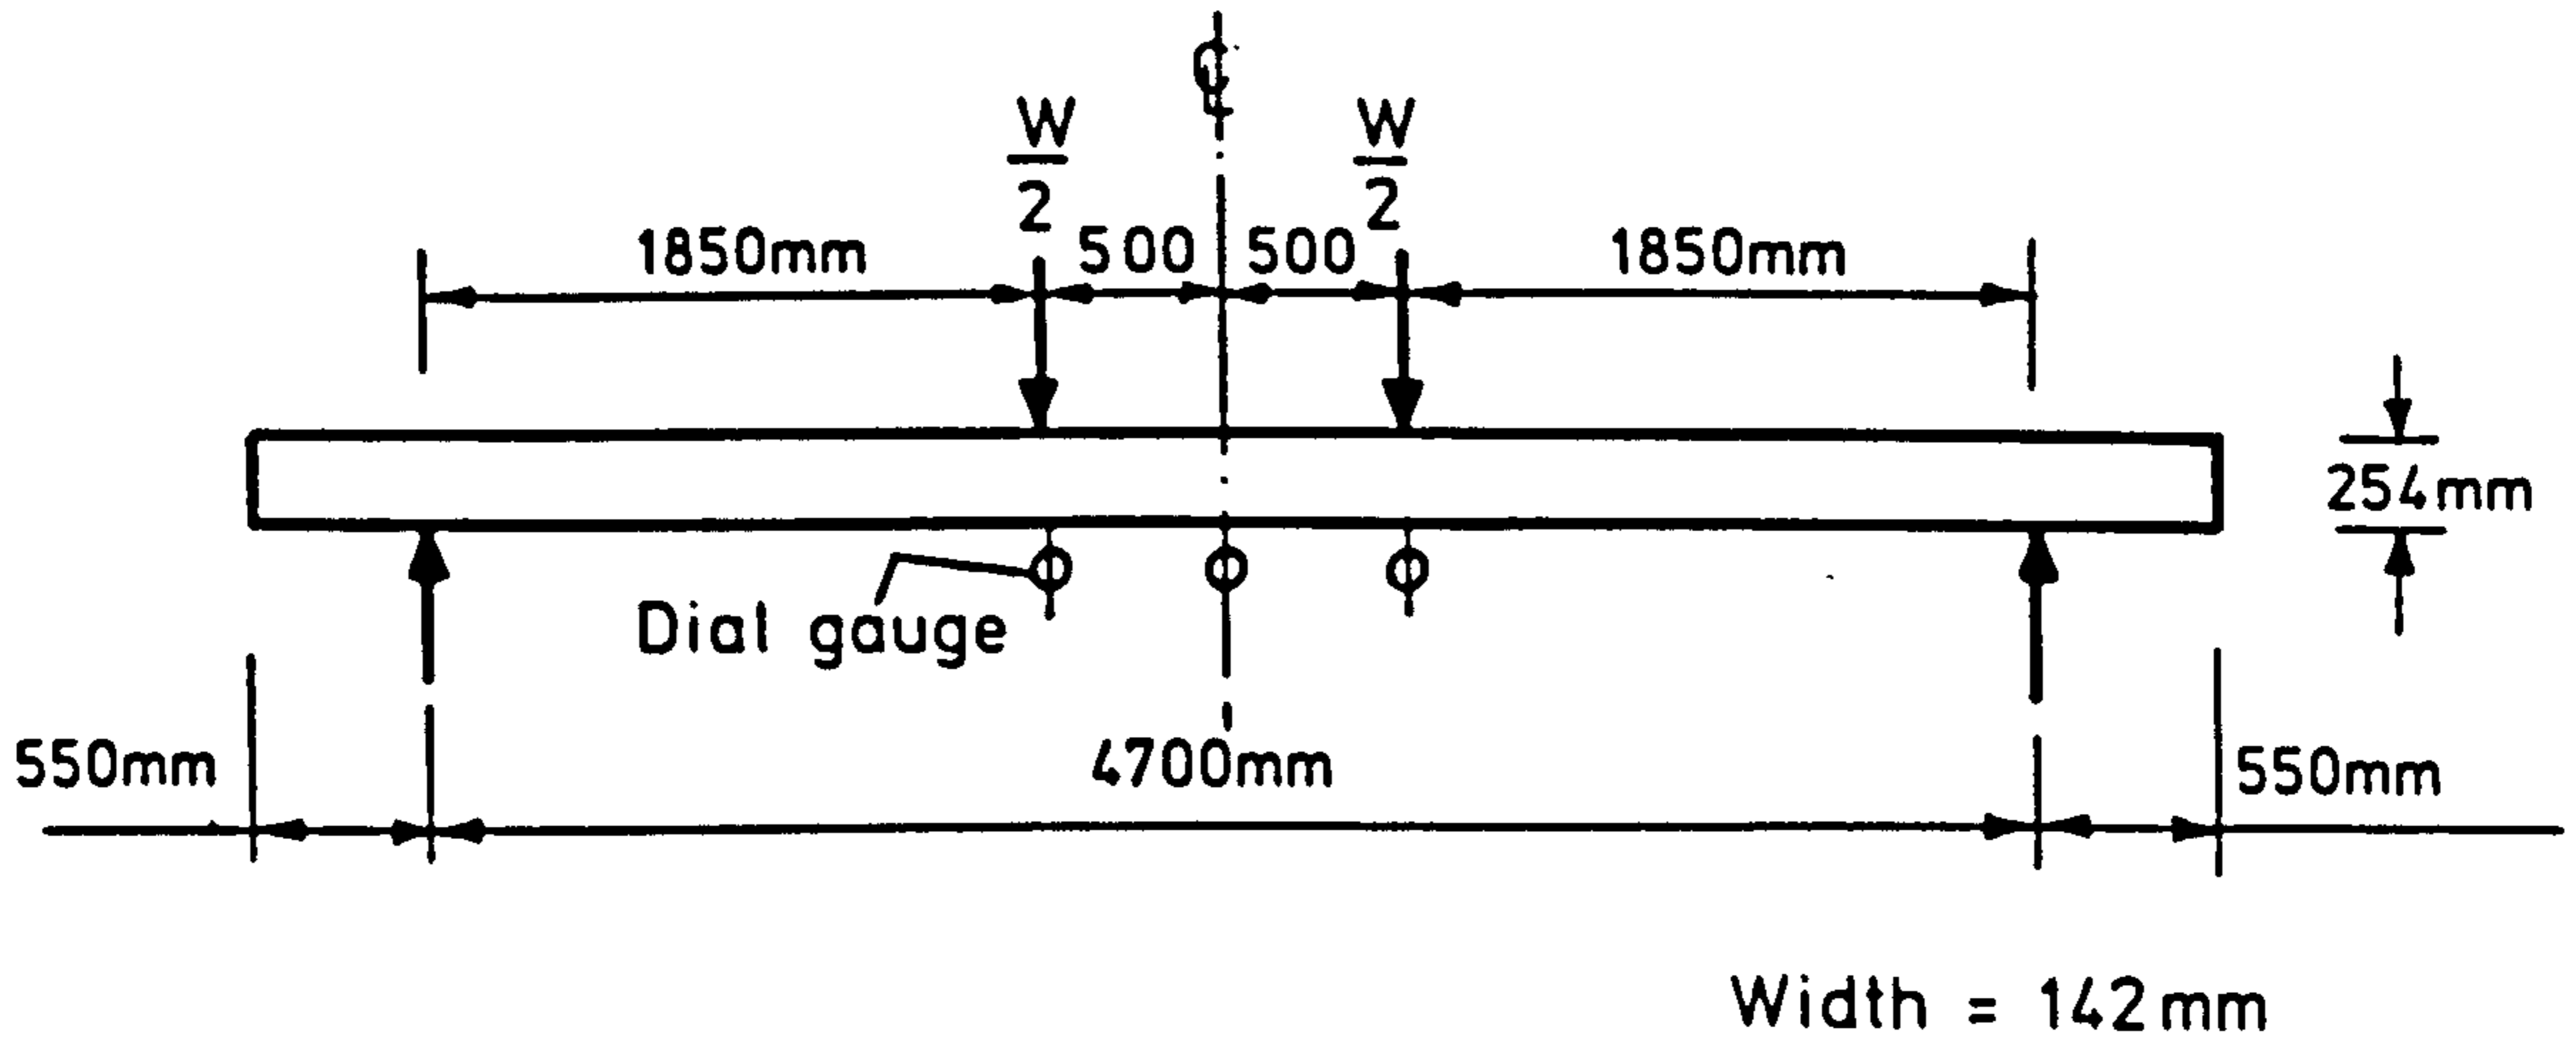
TEST ARRANGEMENT FOR MODEL 2 LONGITUDINAL SECTIONS
